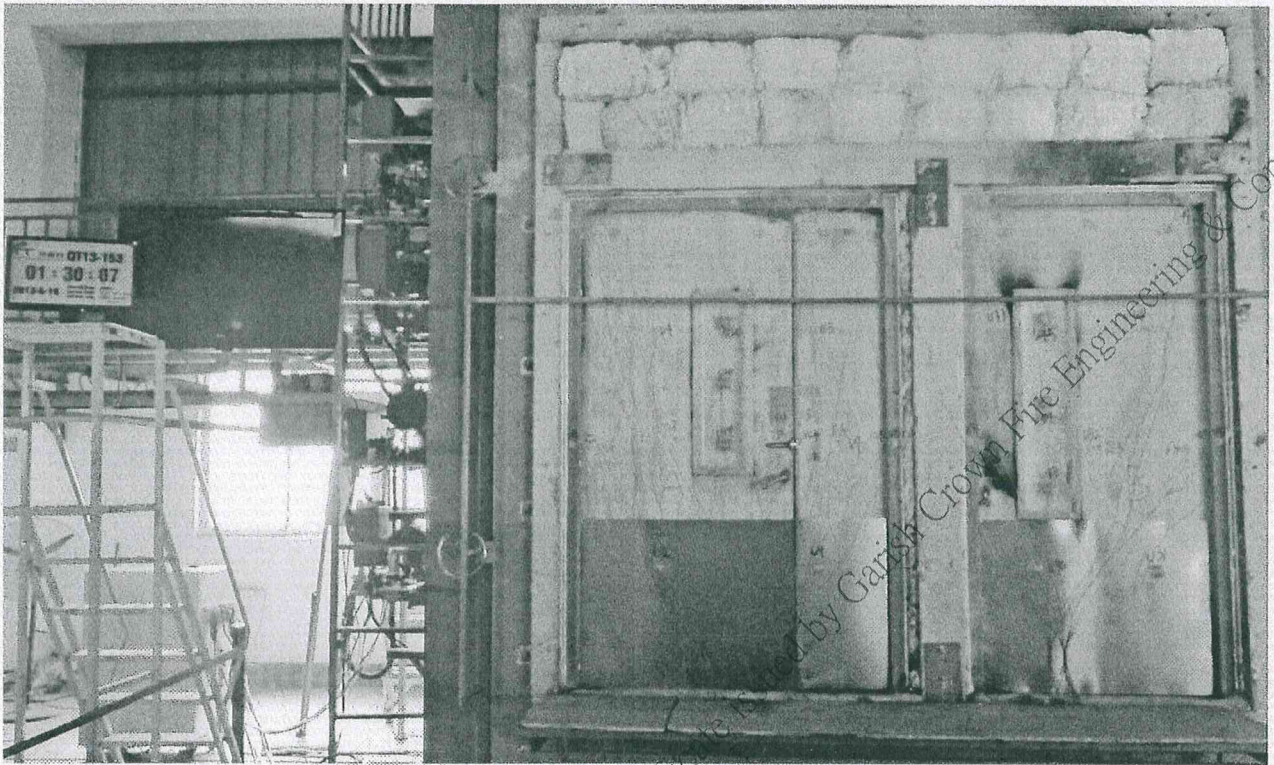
Unexposed surface of the specimen at 90 minute of test. (Left: Door A; Right: Door B)
